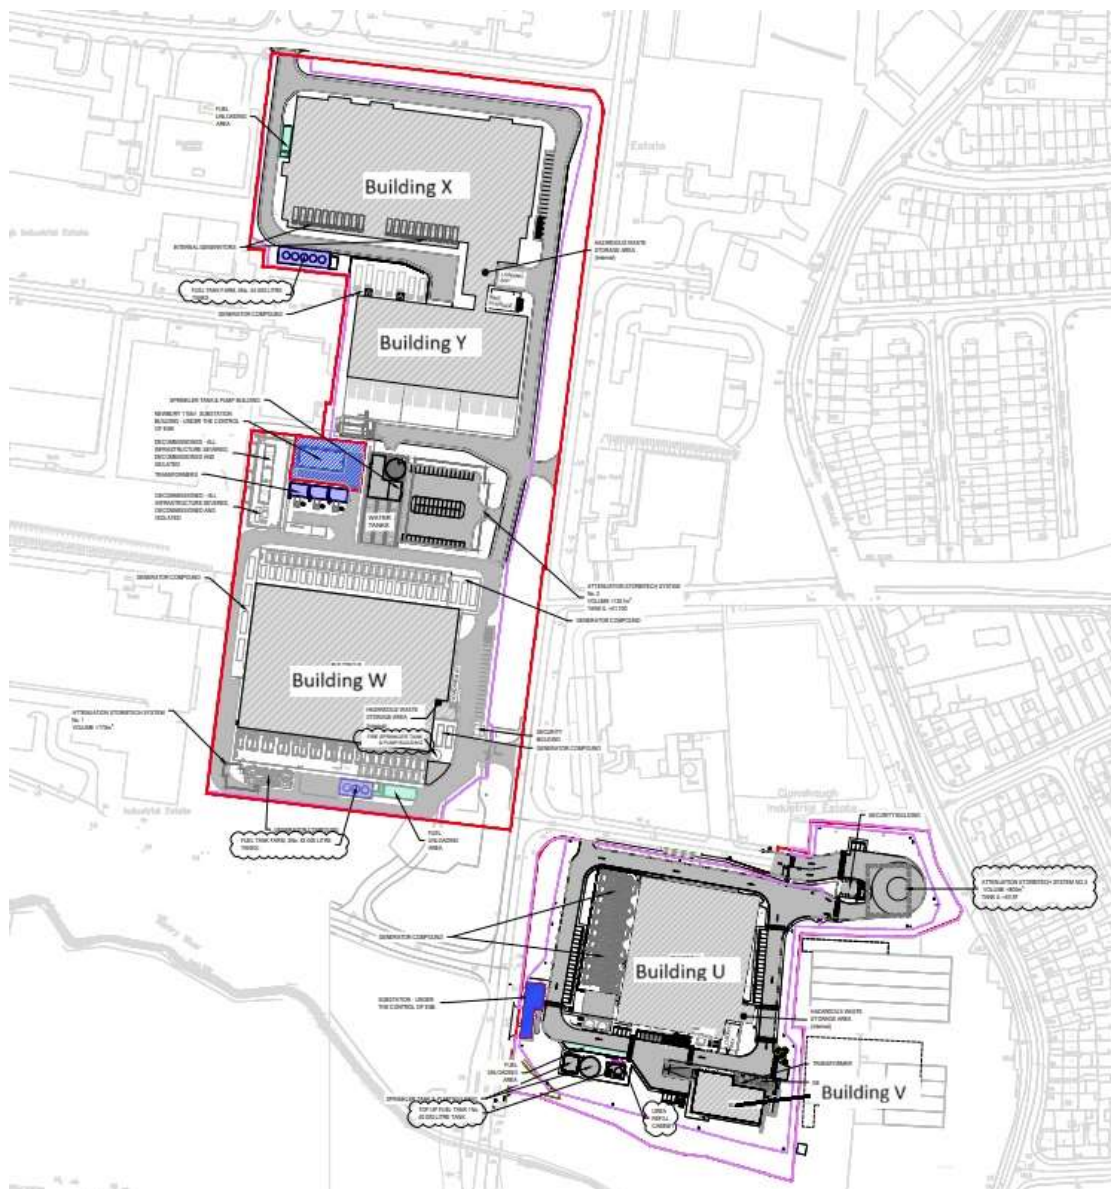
Site Location (21_123F-CSE-00-XX-DR-C-0002 - Site Layout Plan)
